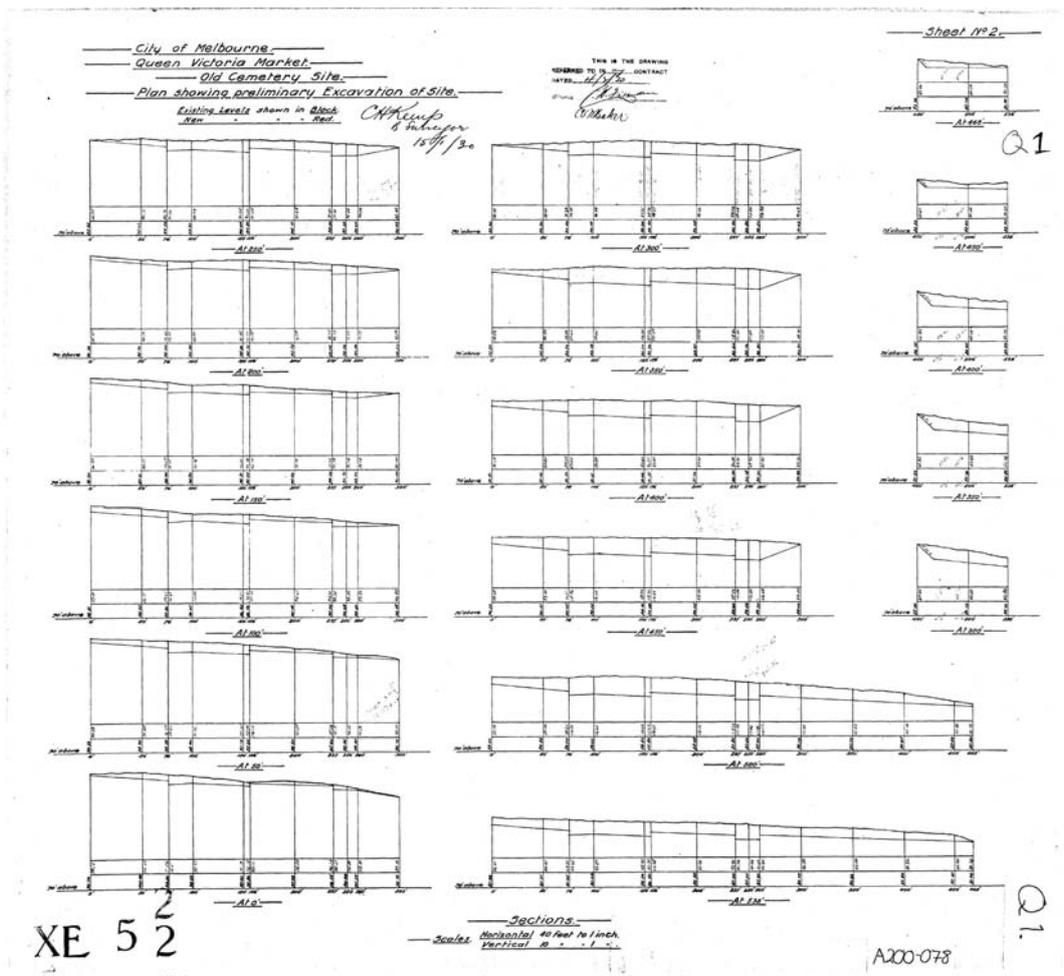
1930 plan showing the preliminary excavation of the Queen Victoria Market site, in advance of the construction of the Franklin Street stores. (Source: City of Melbourne)
